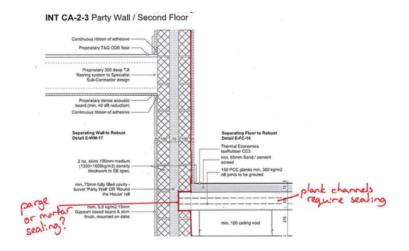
Example of pen test on detail for a party wall to internal floor by West & Matchell Architects, with markups in red pen by LEDA.
